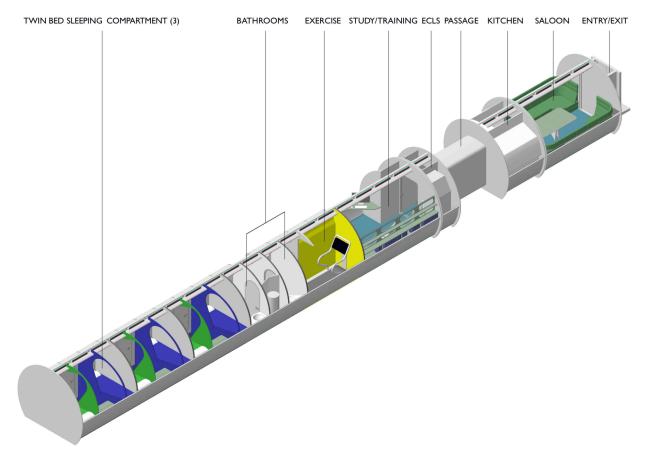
Cutaway Isometric View showing the Laboratory Architectural Layout
